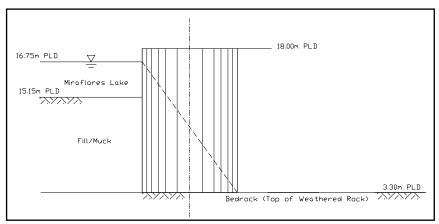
Typical cross-section for the non Tie-Up section during the construction stage
